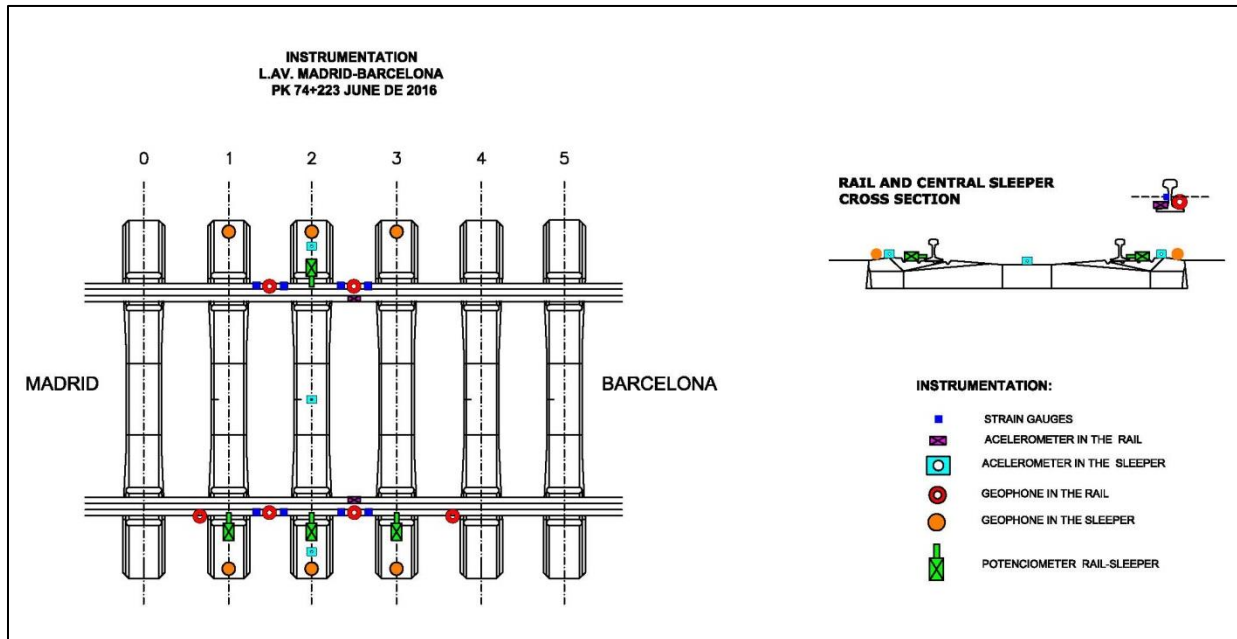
SKETCH OF THE INSTRUMENTATION INSTALLED FOR THE SECOND CAMPAIGN
